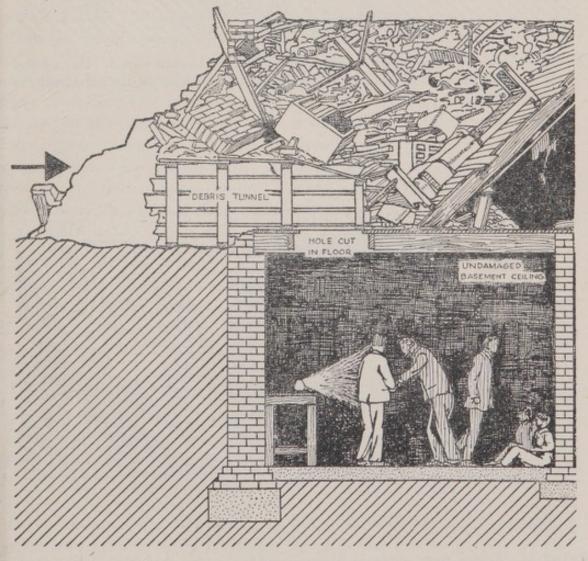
Rescue from a basement where the ceiling remains substantially unbroken.
